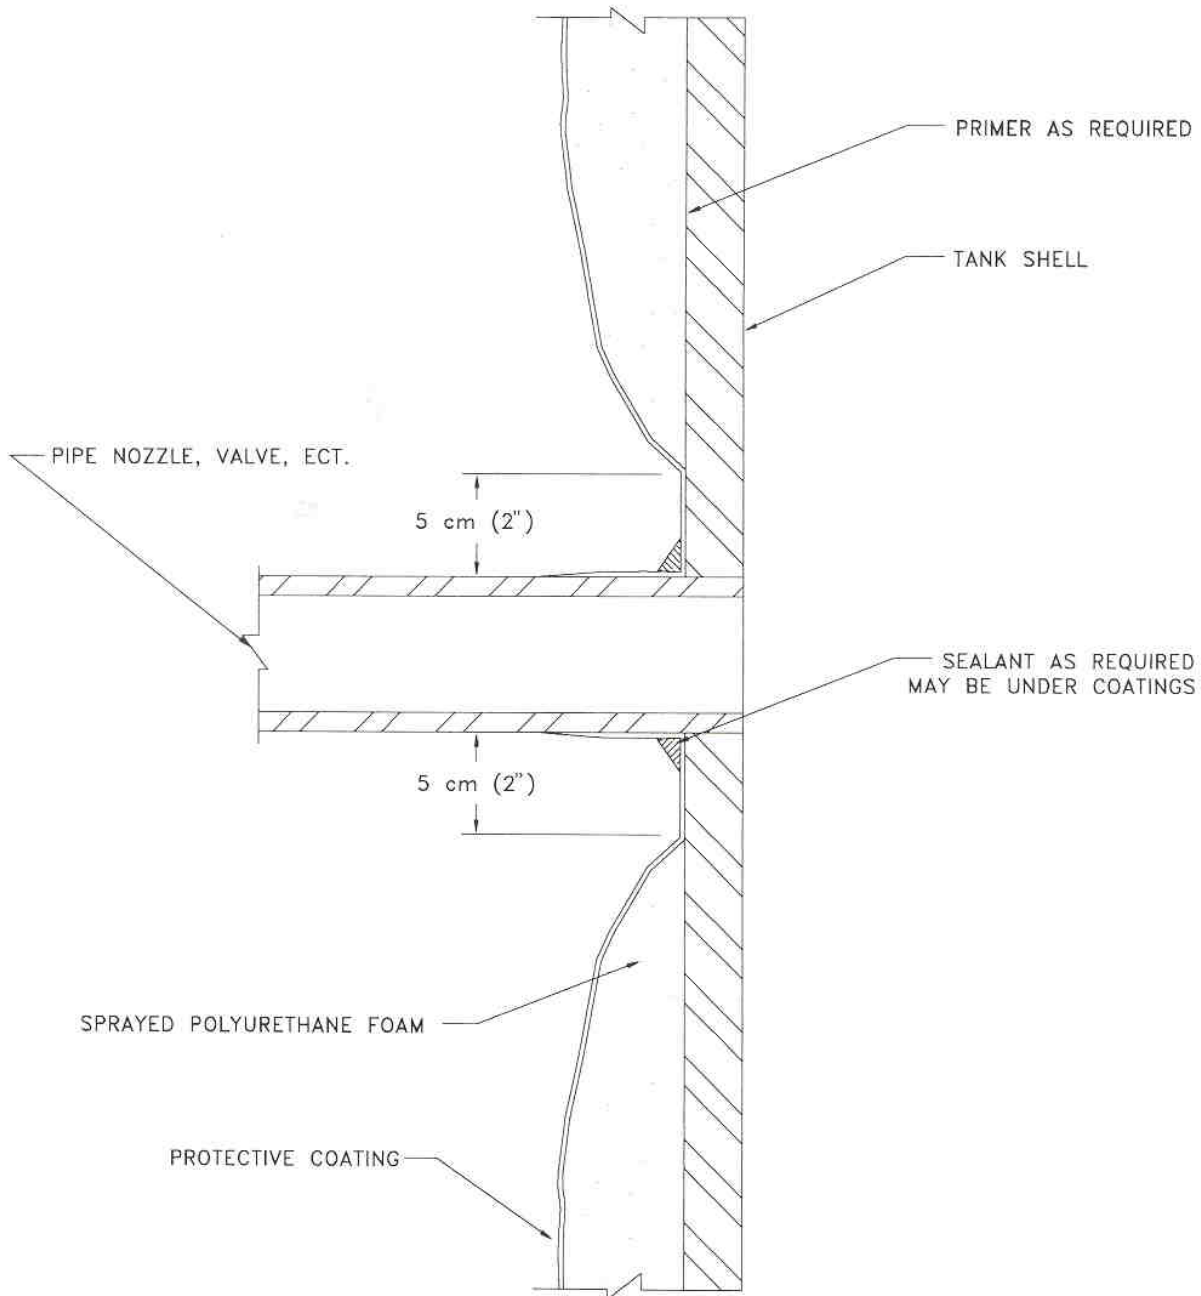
STANDARD PROTRUSION DETAIL
